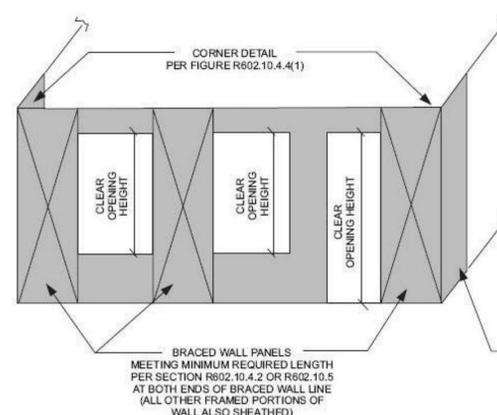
(2) BRACED WALL LINE WITH CONTINUOUS SHEATHING WITH CORNER RETURN PANEL
